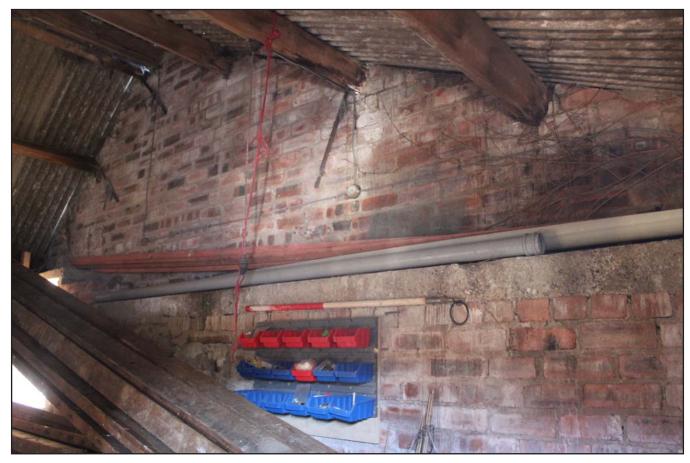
Plas Yn Llan, Cilcain, Flintshire. Internal shot - eastern and northern elevations of Stores - from the southwest - 1m scale
